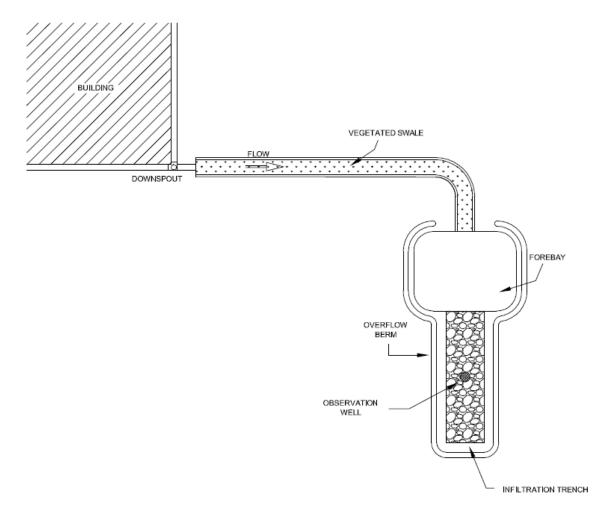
D. Schematic of a typical implementation of an infiltration trench accepting rooftop drainage
